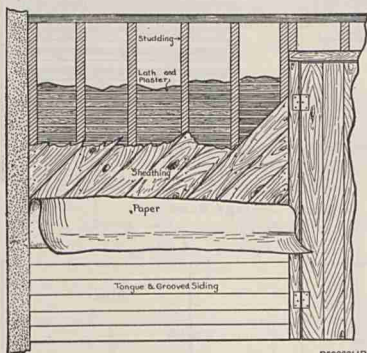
Wall of a storage room in a basement, showing the details of construction. This type of construction is good, but a satisfactory room can be made by omitting the laths and plaster. Many rooms with studding frame and tongue-and-groove siding give excellent results.
